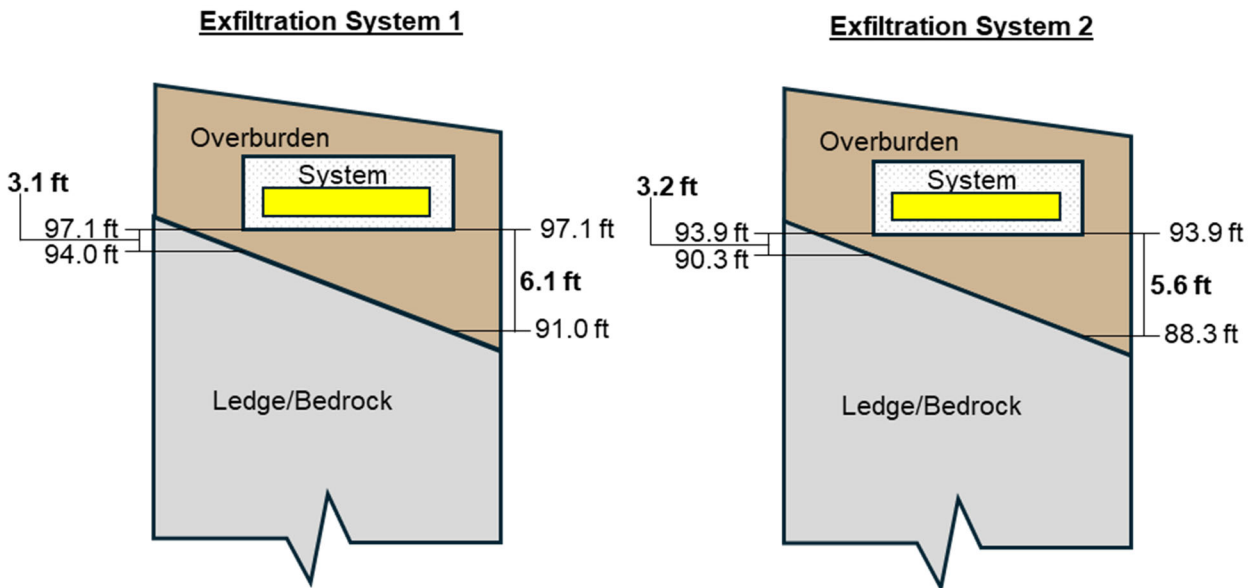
Cross Section Elevations Exfiltration Systems (Not To Scale)
